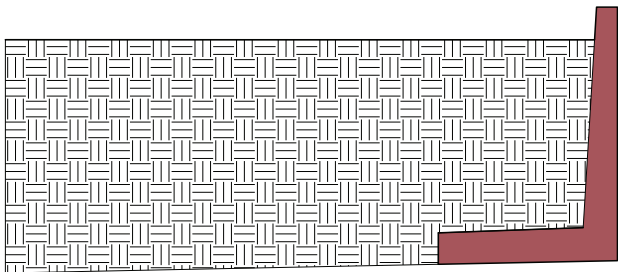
Earth Fill and Pre - Cast Concrete Retaining Wall
